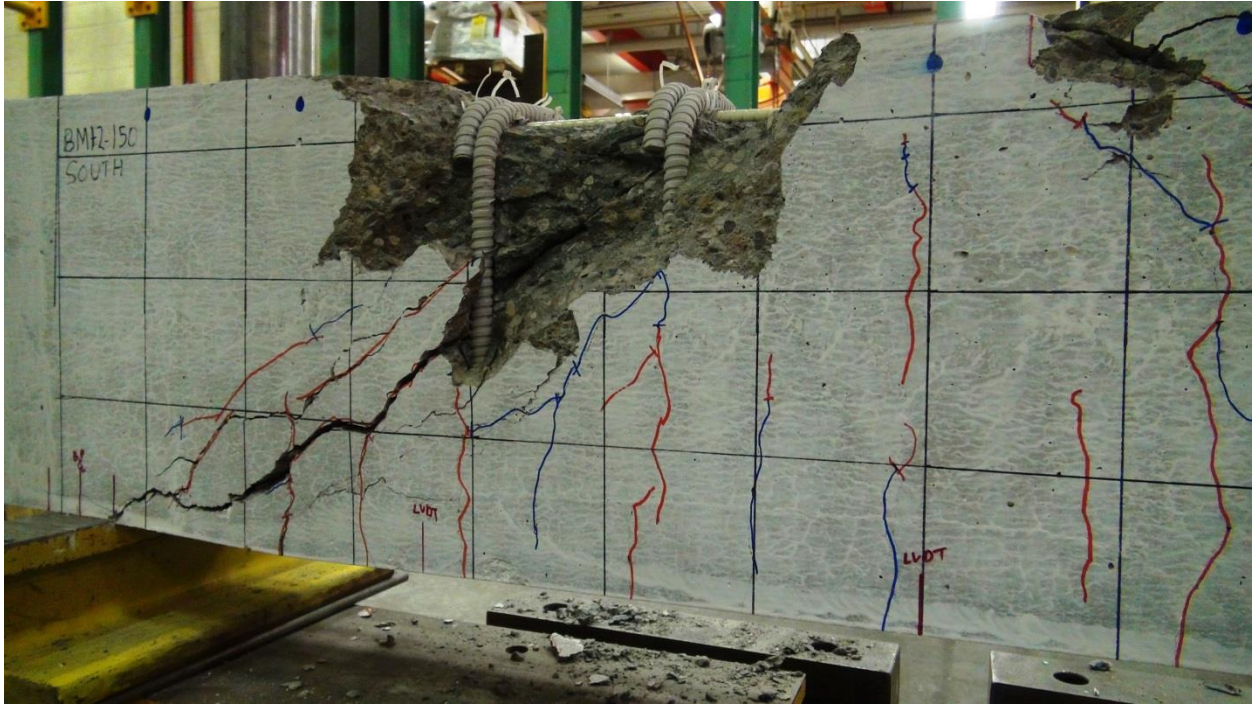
BM12-150 Alternative Photo of Entire Beam Under Load After Testing
